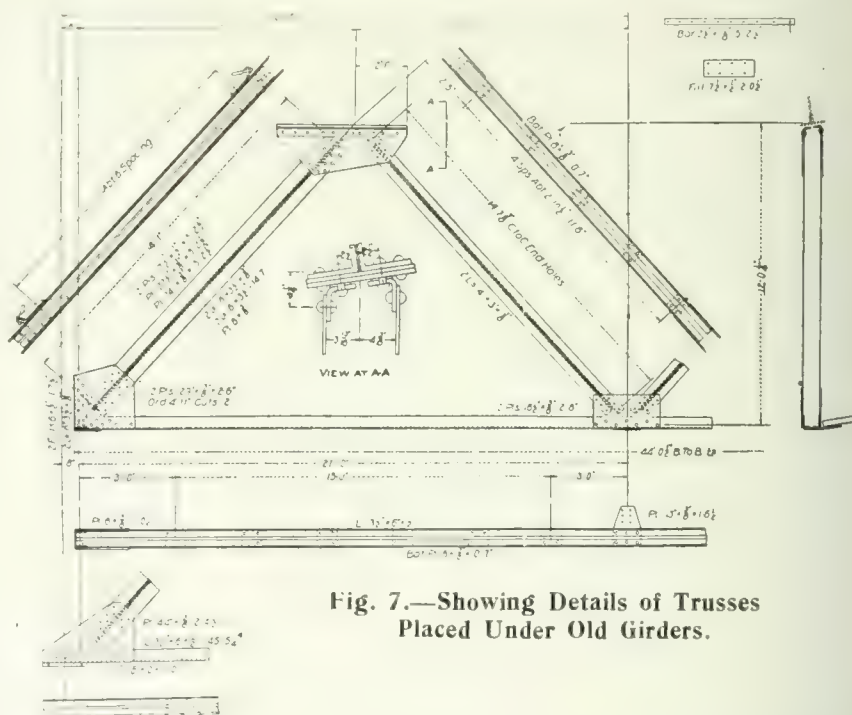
Showing Details of Trusses Placed Under Old Girders.
